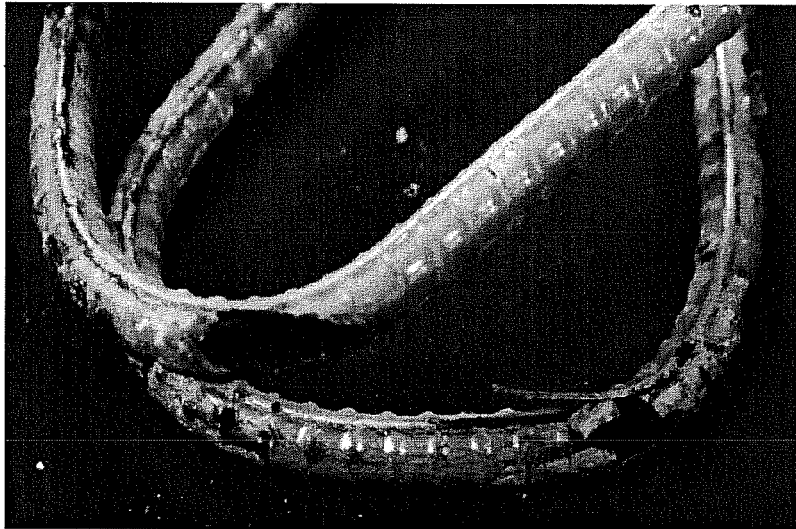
Corrosion Damage on Stirrup (Beam 30).
